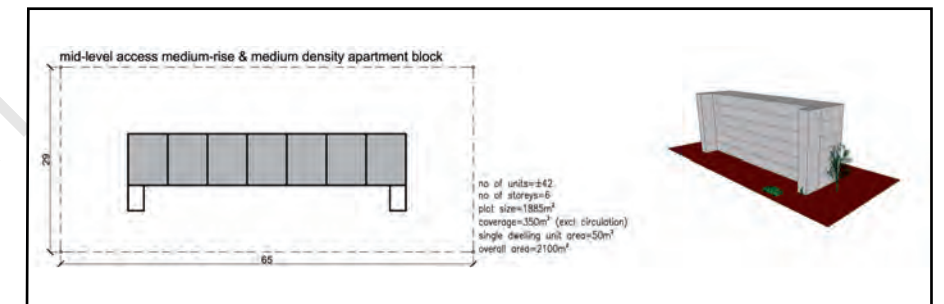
Mid-level access apartment block (for sloping sites) type H (Source: down to erf)
